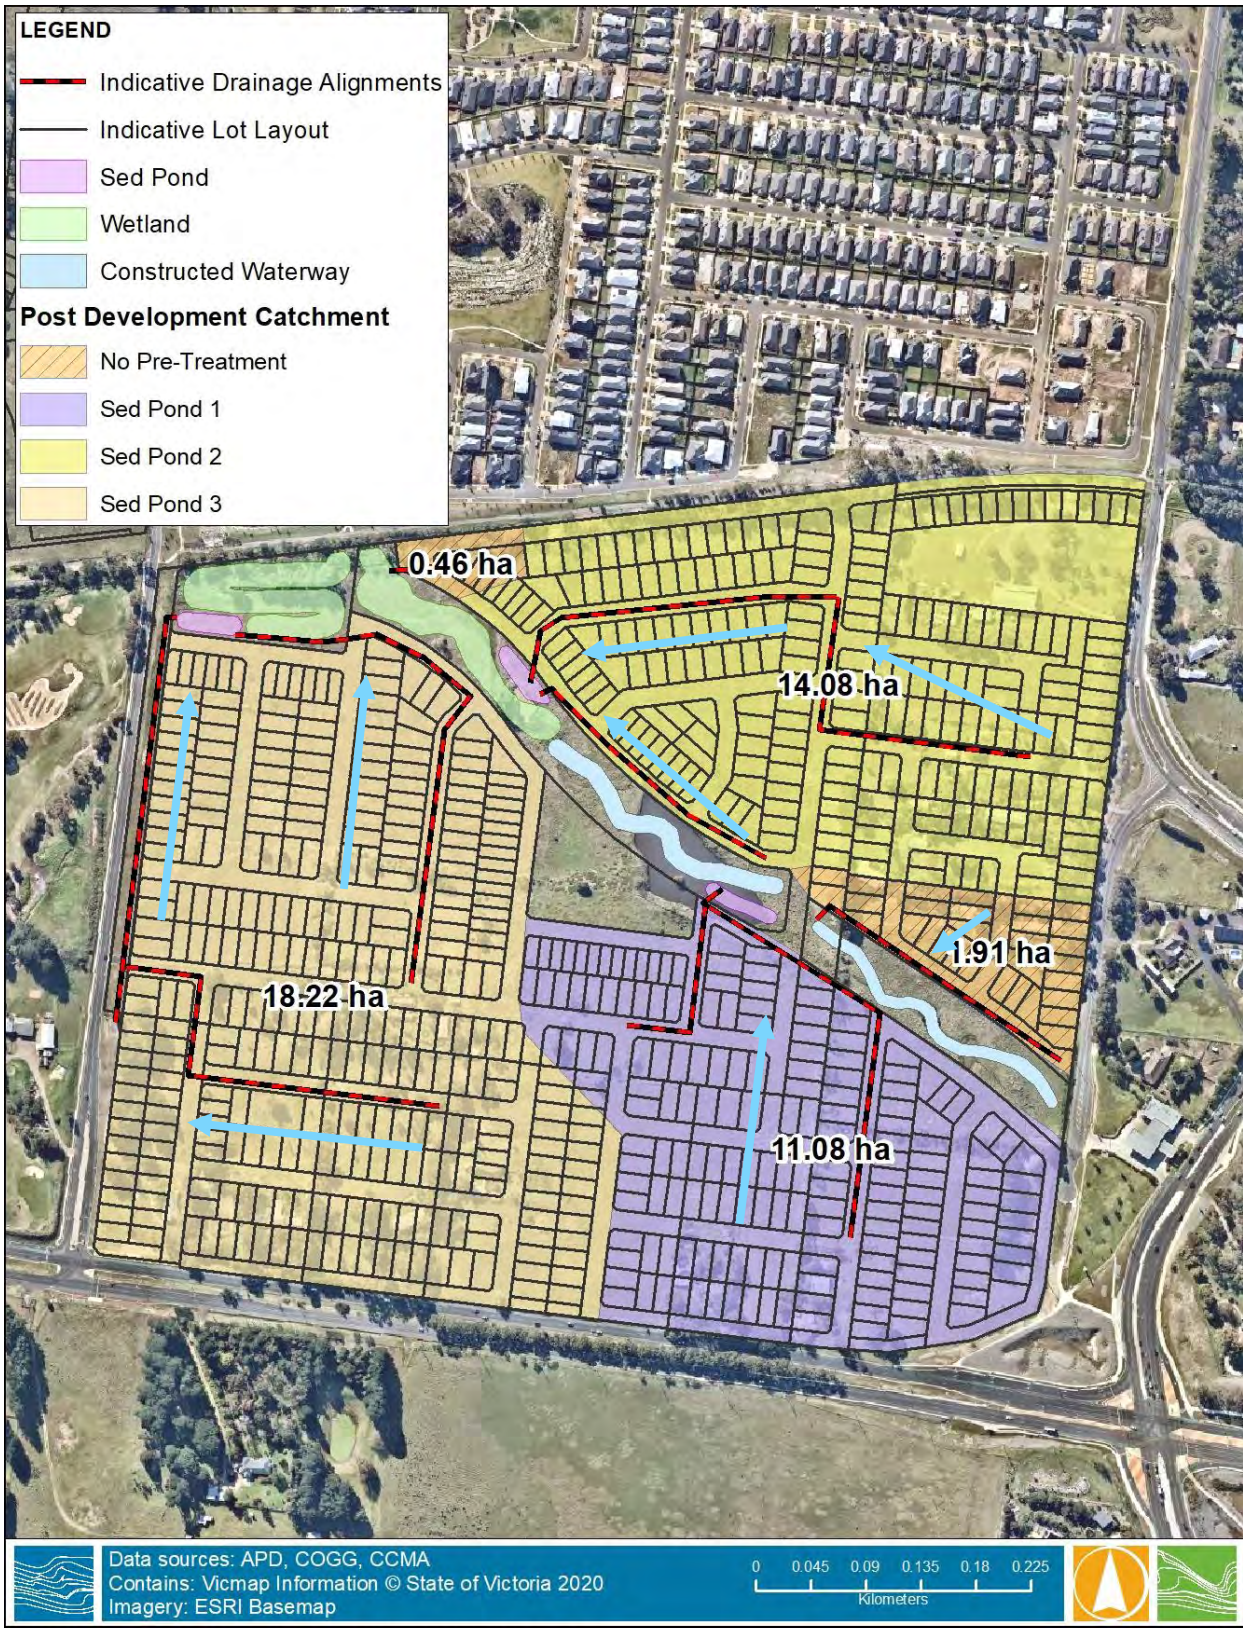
WSUD ASSET LOCATION AND INDICATIVE DRAINAGE ALIGNMENT
